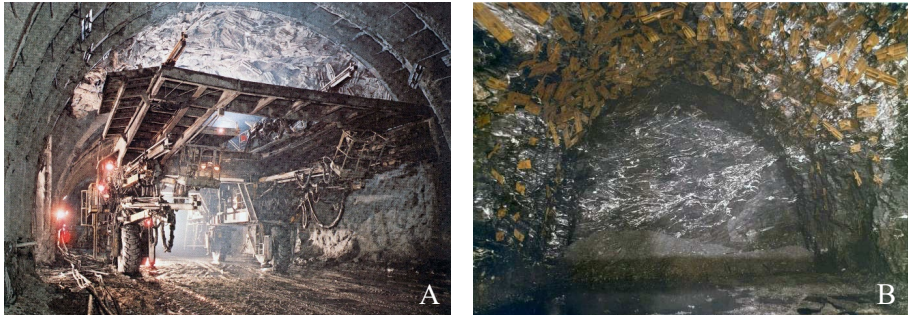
Fréjus motorway Tunnel (1975) – Conventional excavation method: A) Drill carriage; B) Confinement operations by ancral roof bolts (Steel quality: Aq 60-Aq 70; Roof bolts length: 3,5 – 5 m; Intensity: 1 – 1,5 bolt/m²).
